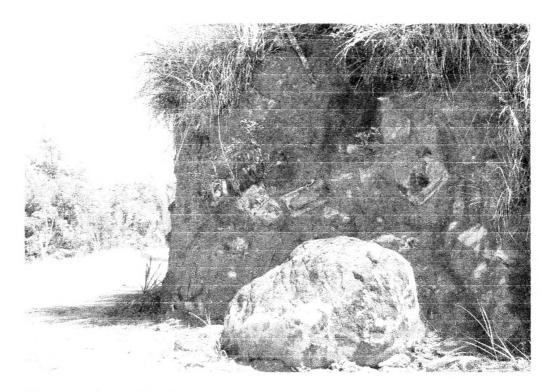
A deep road cut where the cut slope is not properly supported with a retaining structure
